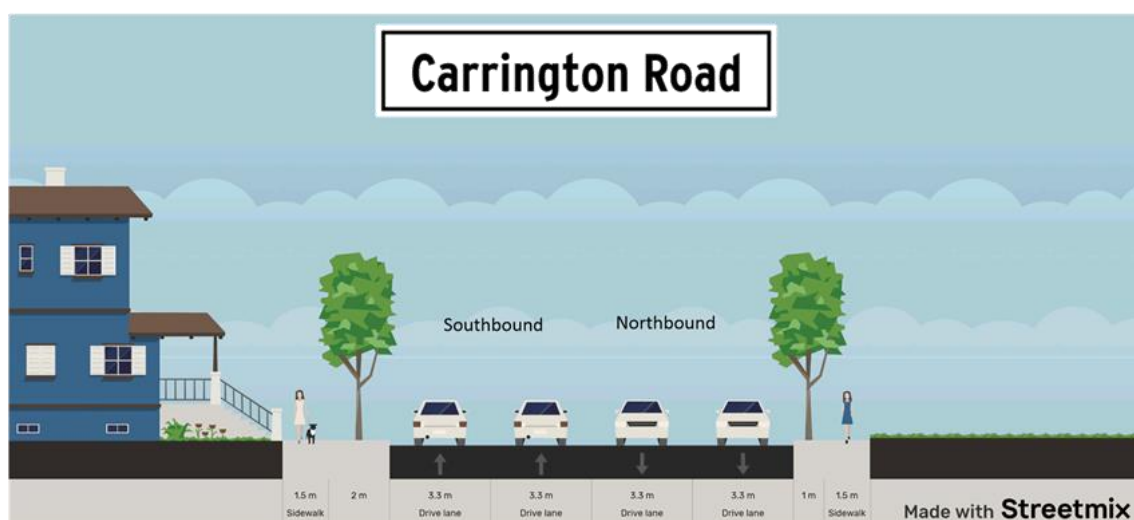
Cross Section of Existing Carrington Road (134 Carrington Road)
